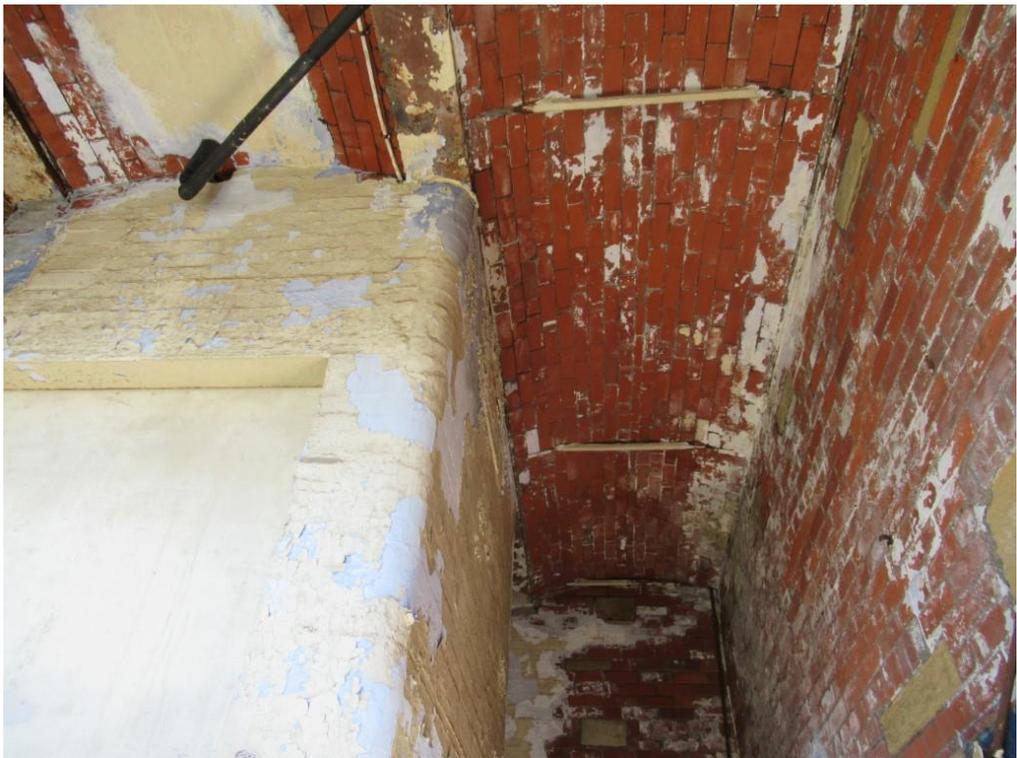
Further view of the barrel vaulted ceiling, again in excellent condition.
